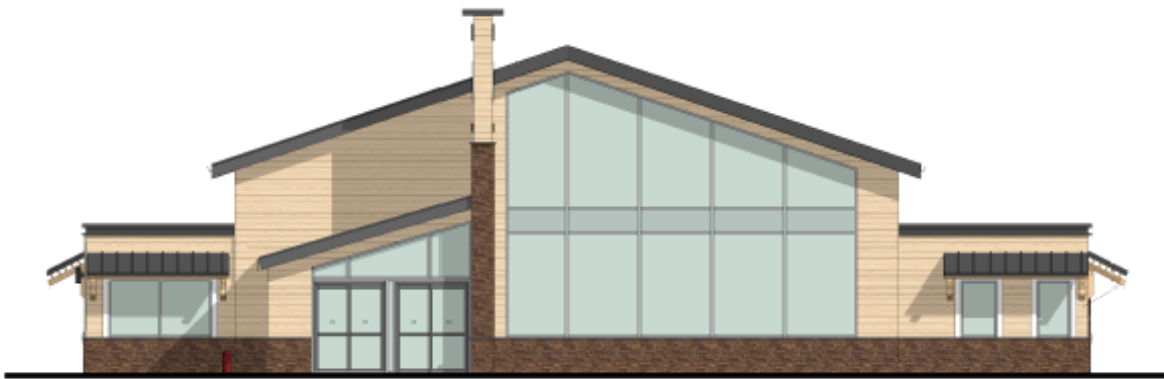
West Elevation - primary client and patient entrance off the primary parking lot.
